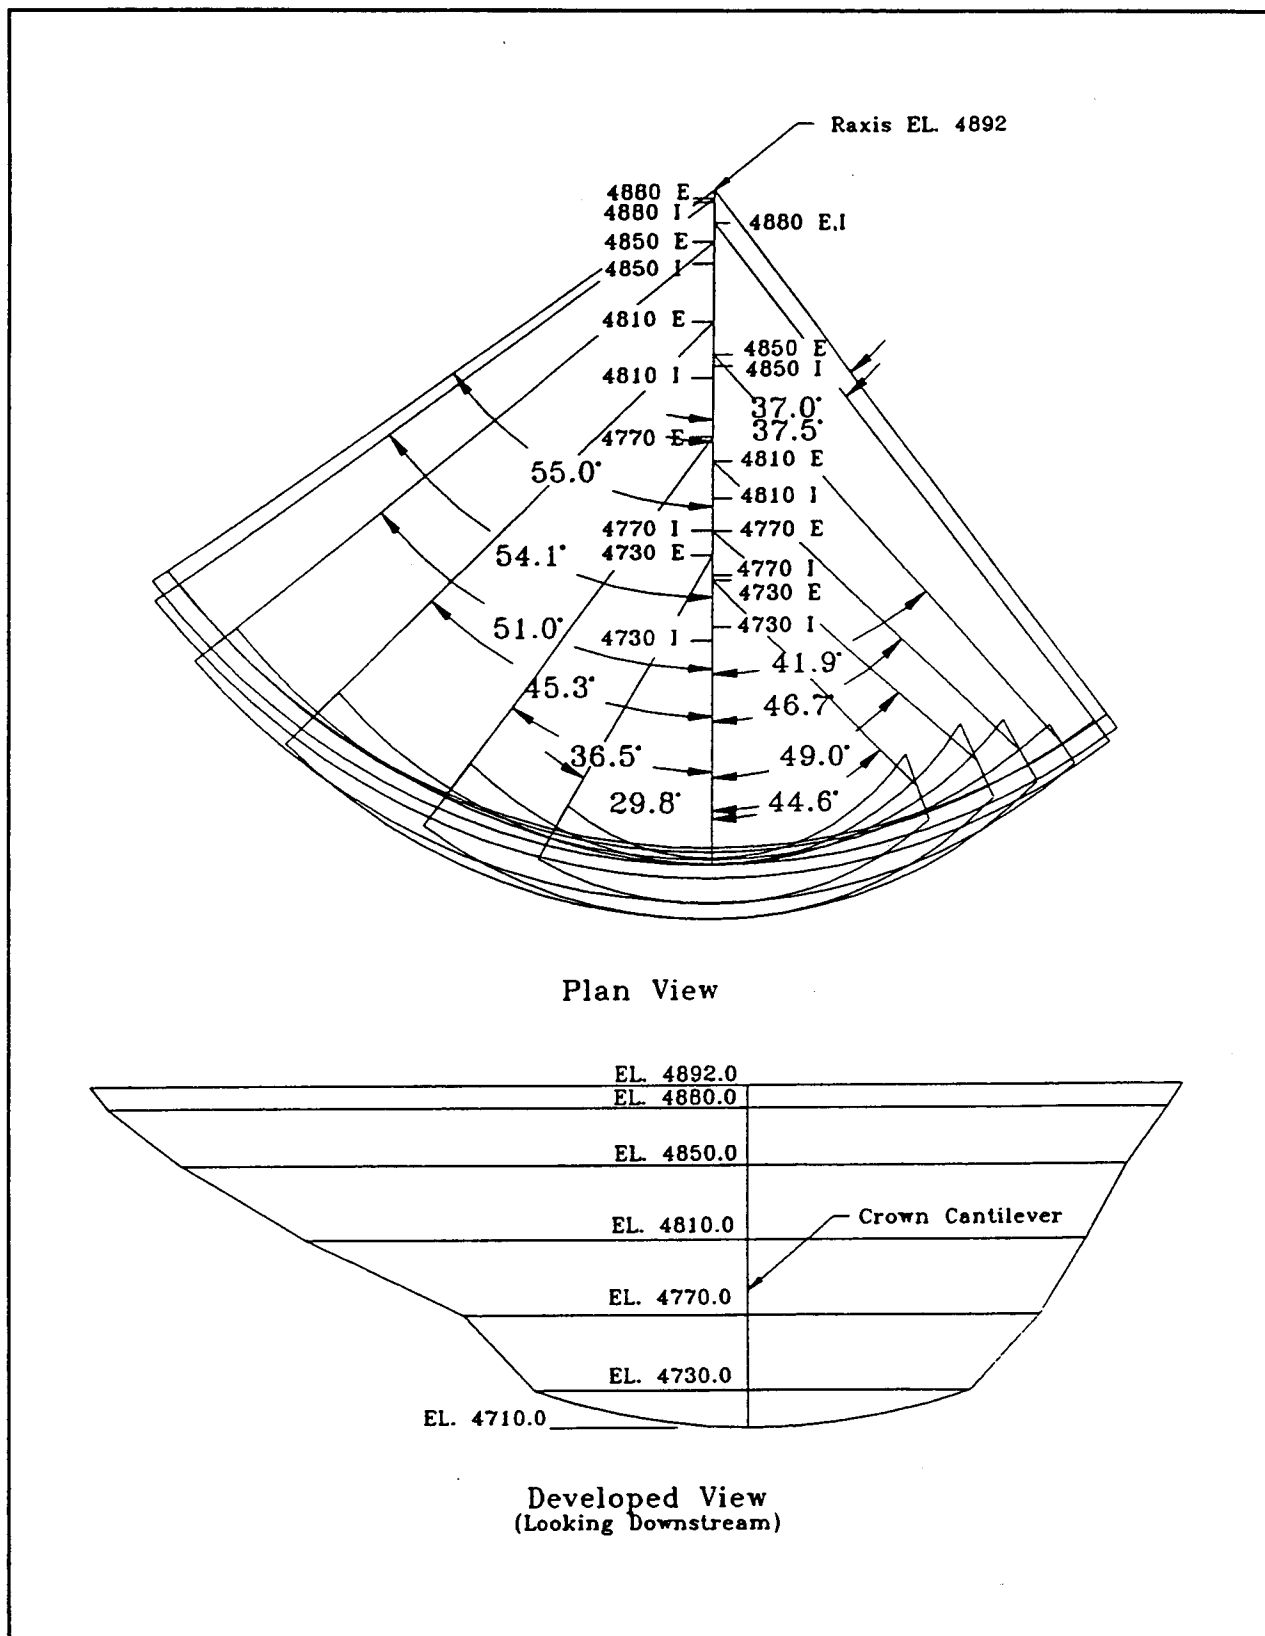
Plan view and developed profile for the two-centered arch dam example
